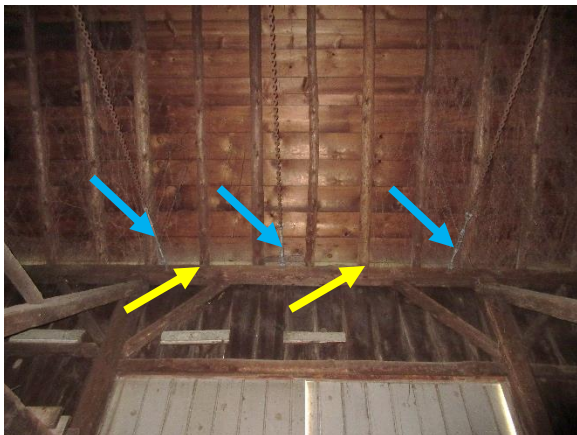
Interior view of north side of barn. Note the connection of the roof rafters to the plate beams (yellow arrows) and the turnbuckles serving as tie beams (blue arrows).
